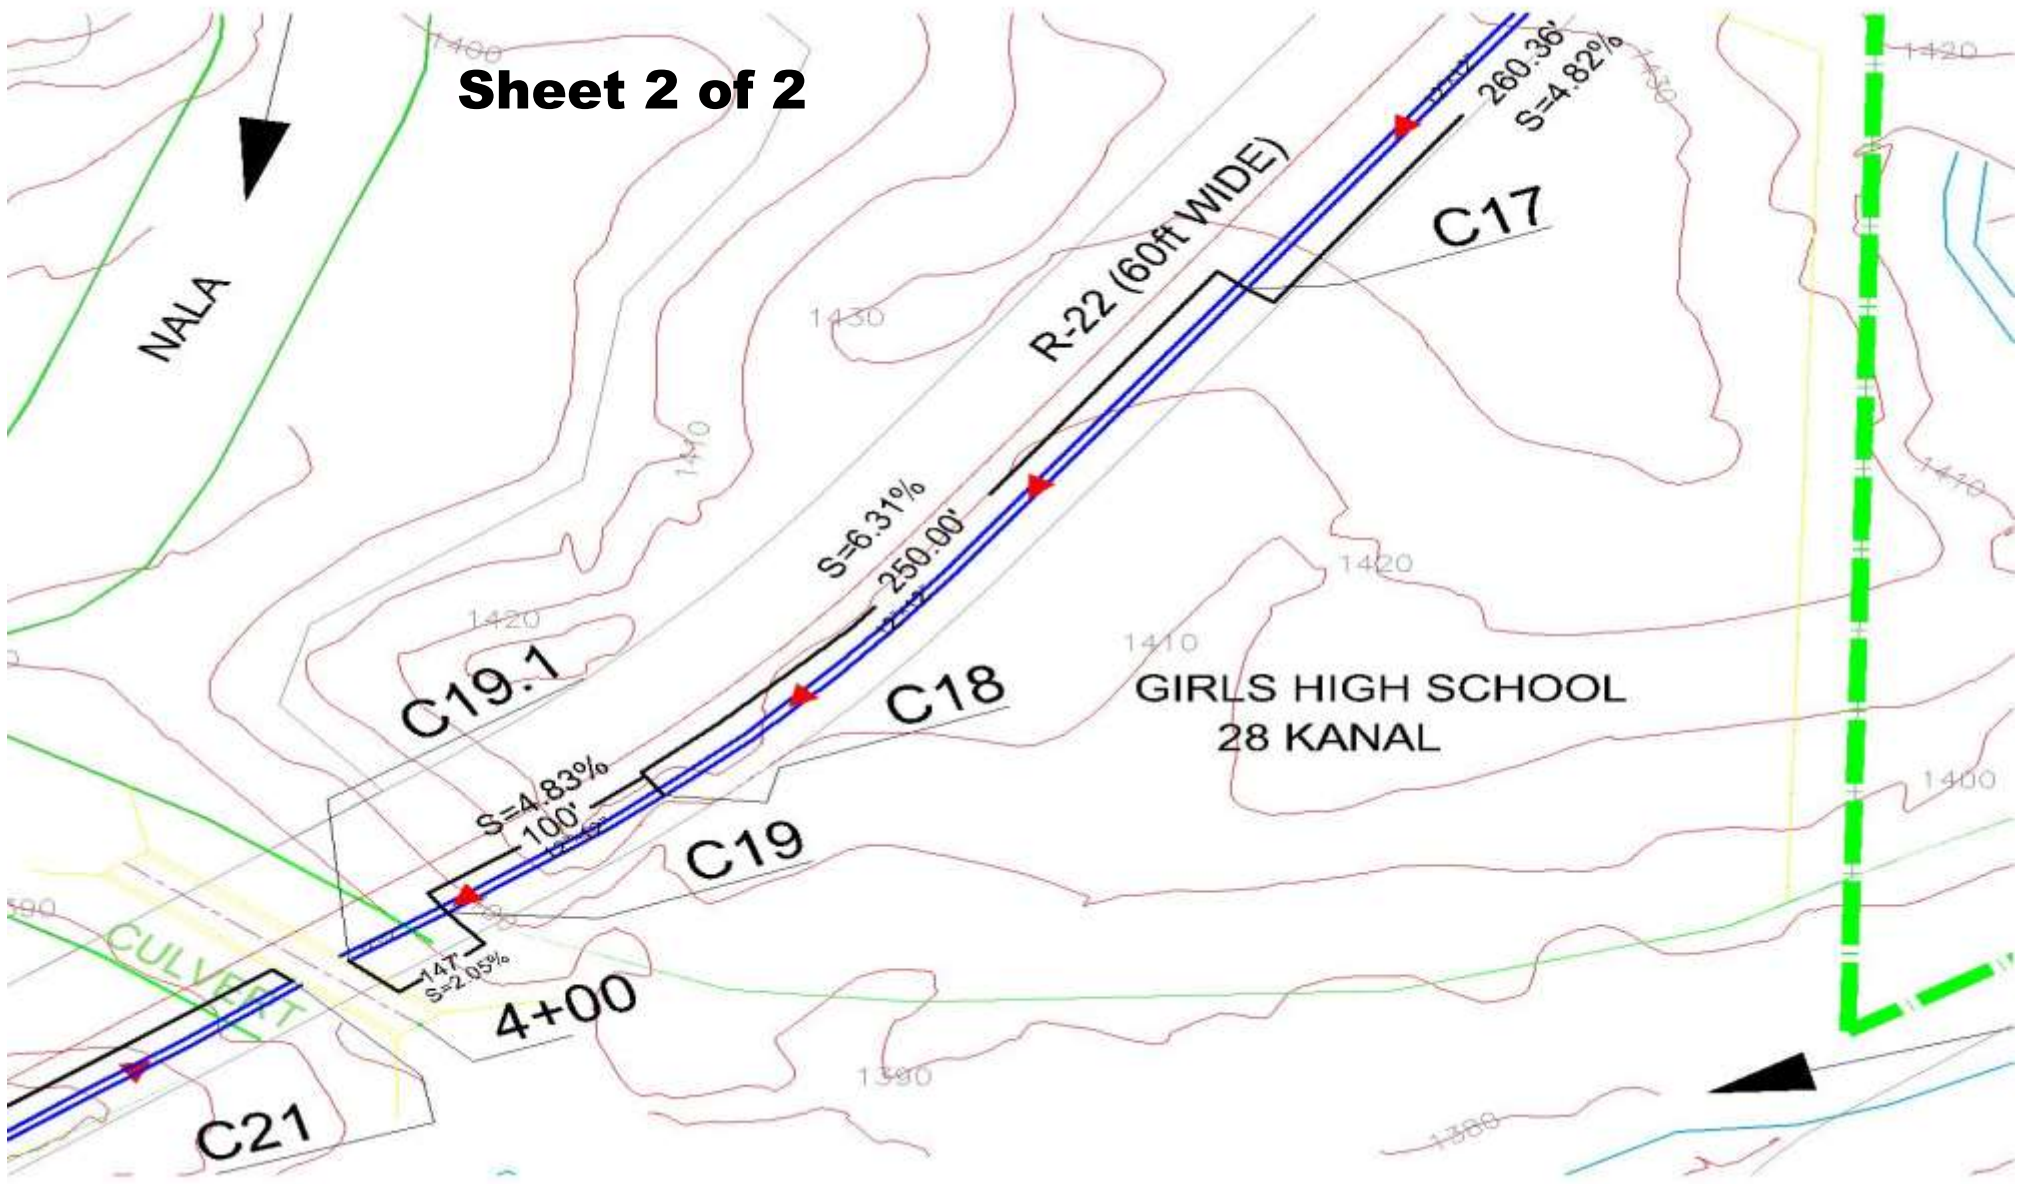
Storm drainage layout plan of Sub-catchment-16 showing final disposal node C19.1
